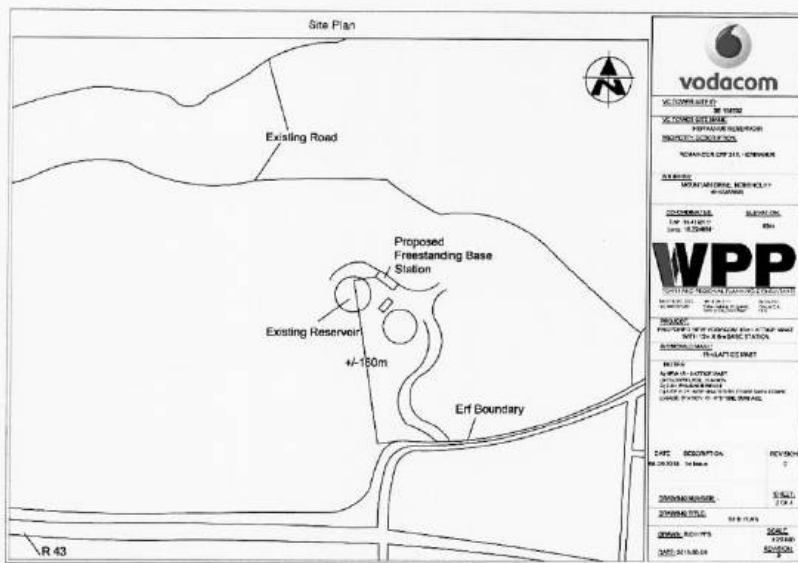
Site Plan: Illustrating the proposed TT location in relation to existing infrastructure. Source: Warren Petterson Planning (2019)
